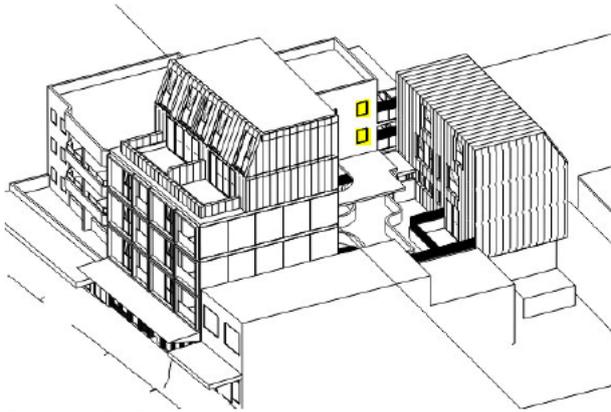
Proposed 11am view from sun diagram – NB: north-facing living room windows highlighted yellow (Source: Arkhaus)
